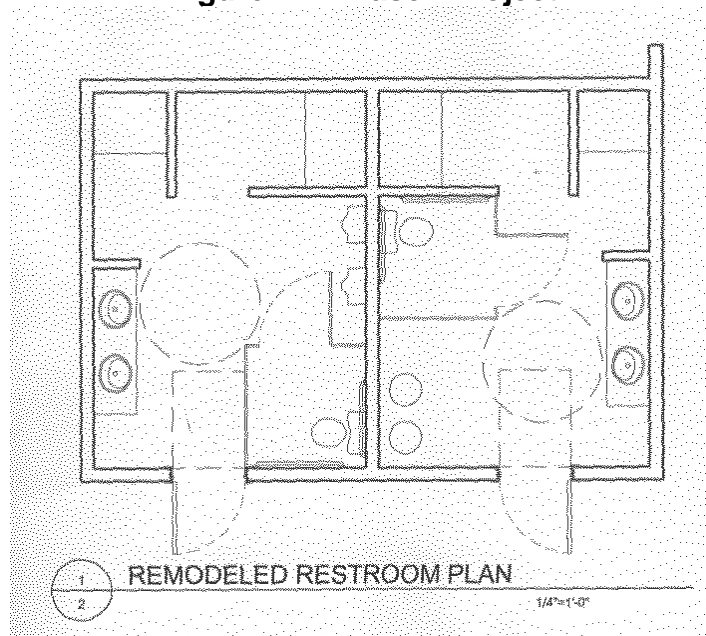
Phase 1 Proposed ADA compliant Restroom Floor Plan
